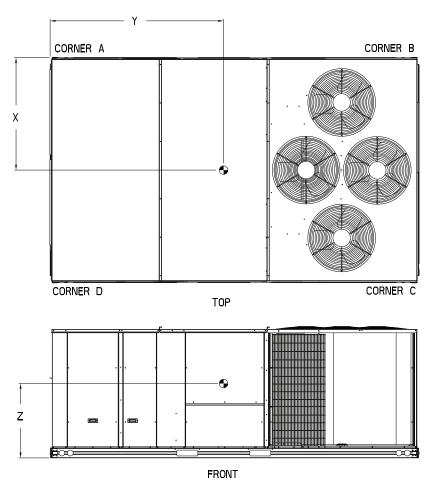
Unit Dimensional Drawing - 24 and 28 Size Units (cont.)
